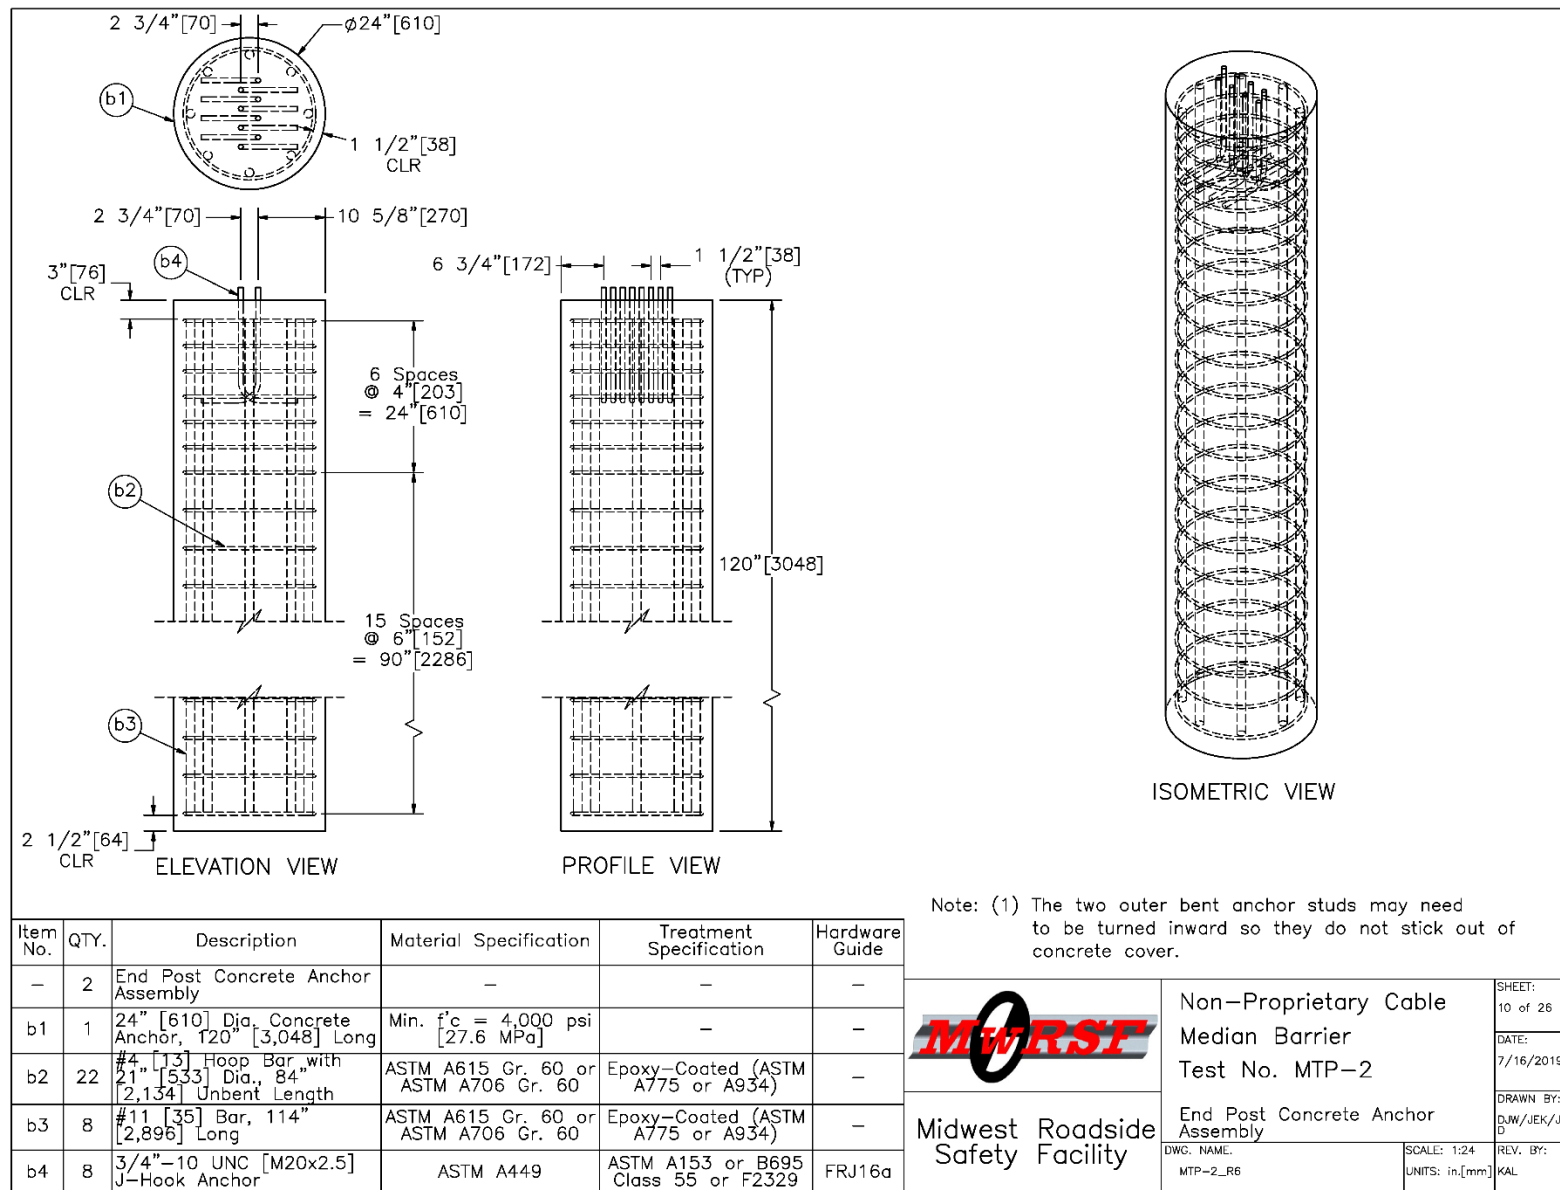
End Post Concrete Anchor Assembly, Test No. MTP-2
